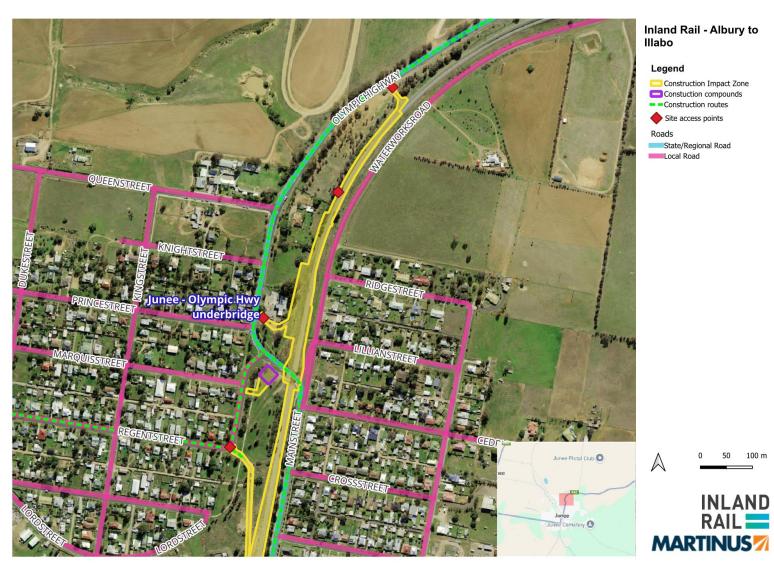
OLYMPIC HIGHWAY CONSTRUCTION ROUTES (2 OF 2)
